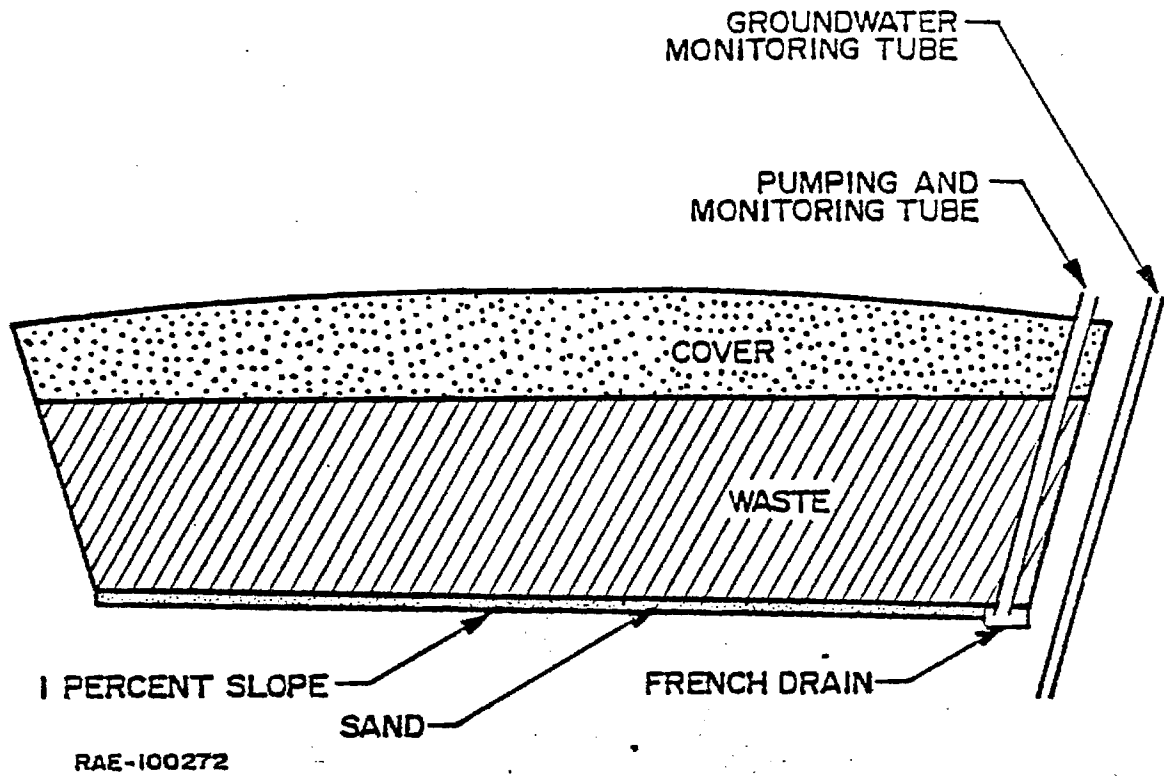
a. CROSS SECTION OF TYPICAL TRENCH
